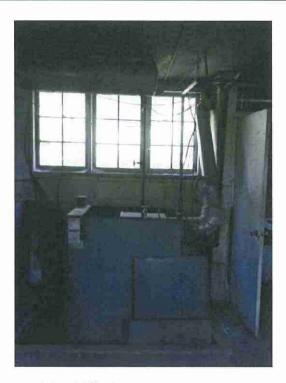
Deteriorated wood framed windows at Bldg. 2.
